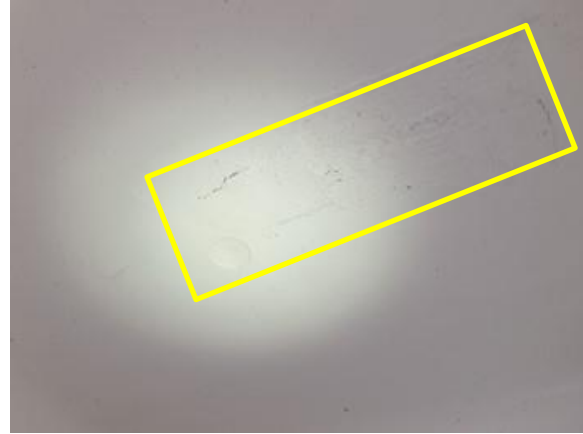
Concrete spalling at the Underside of the Slab.
